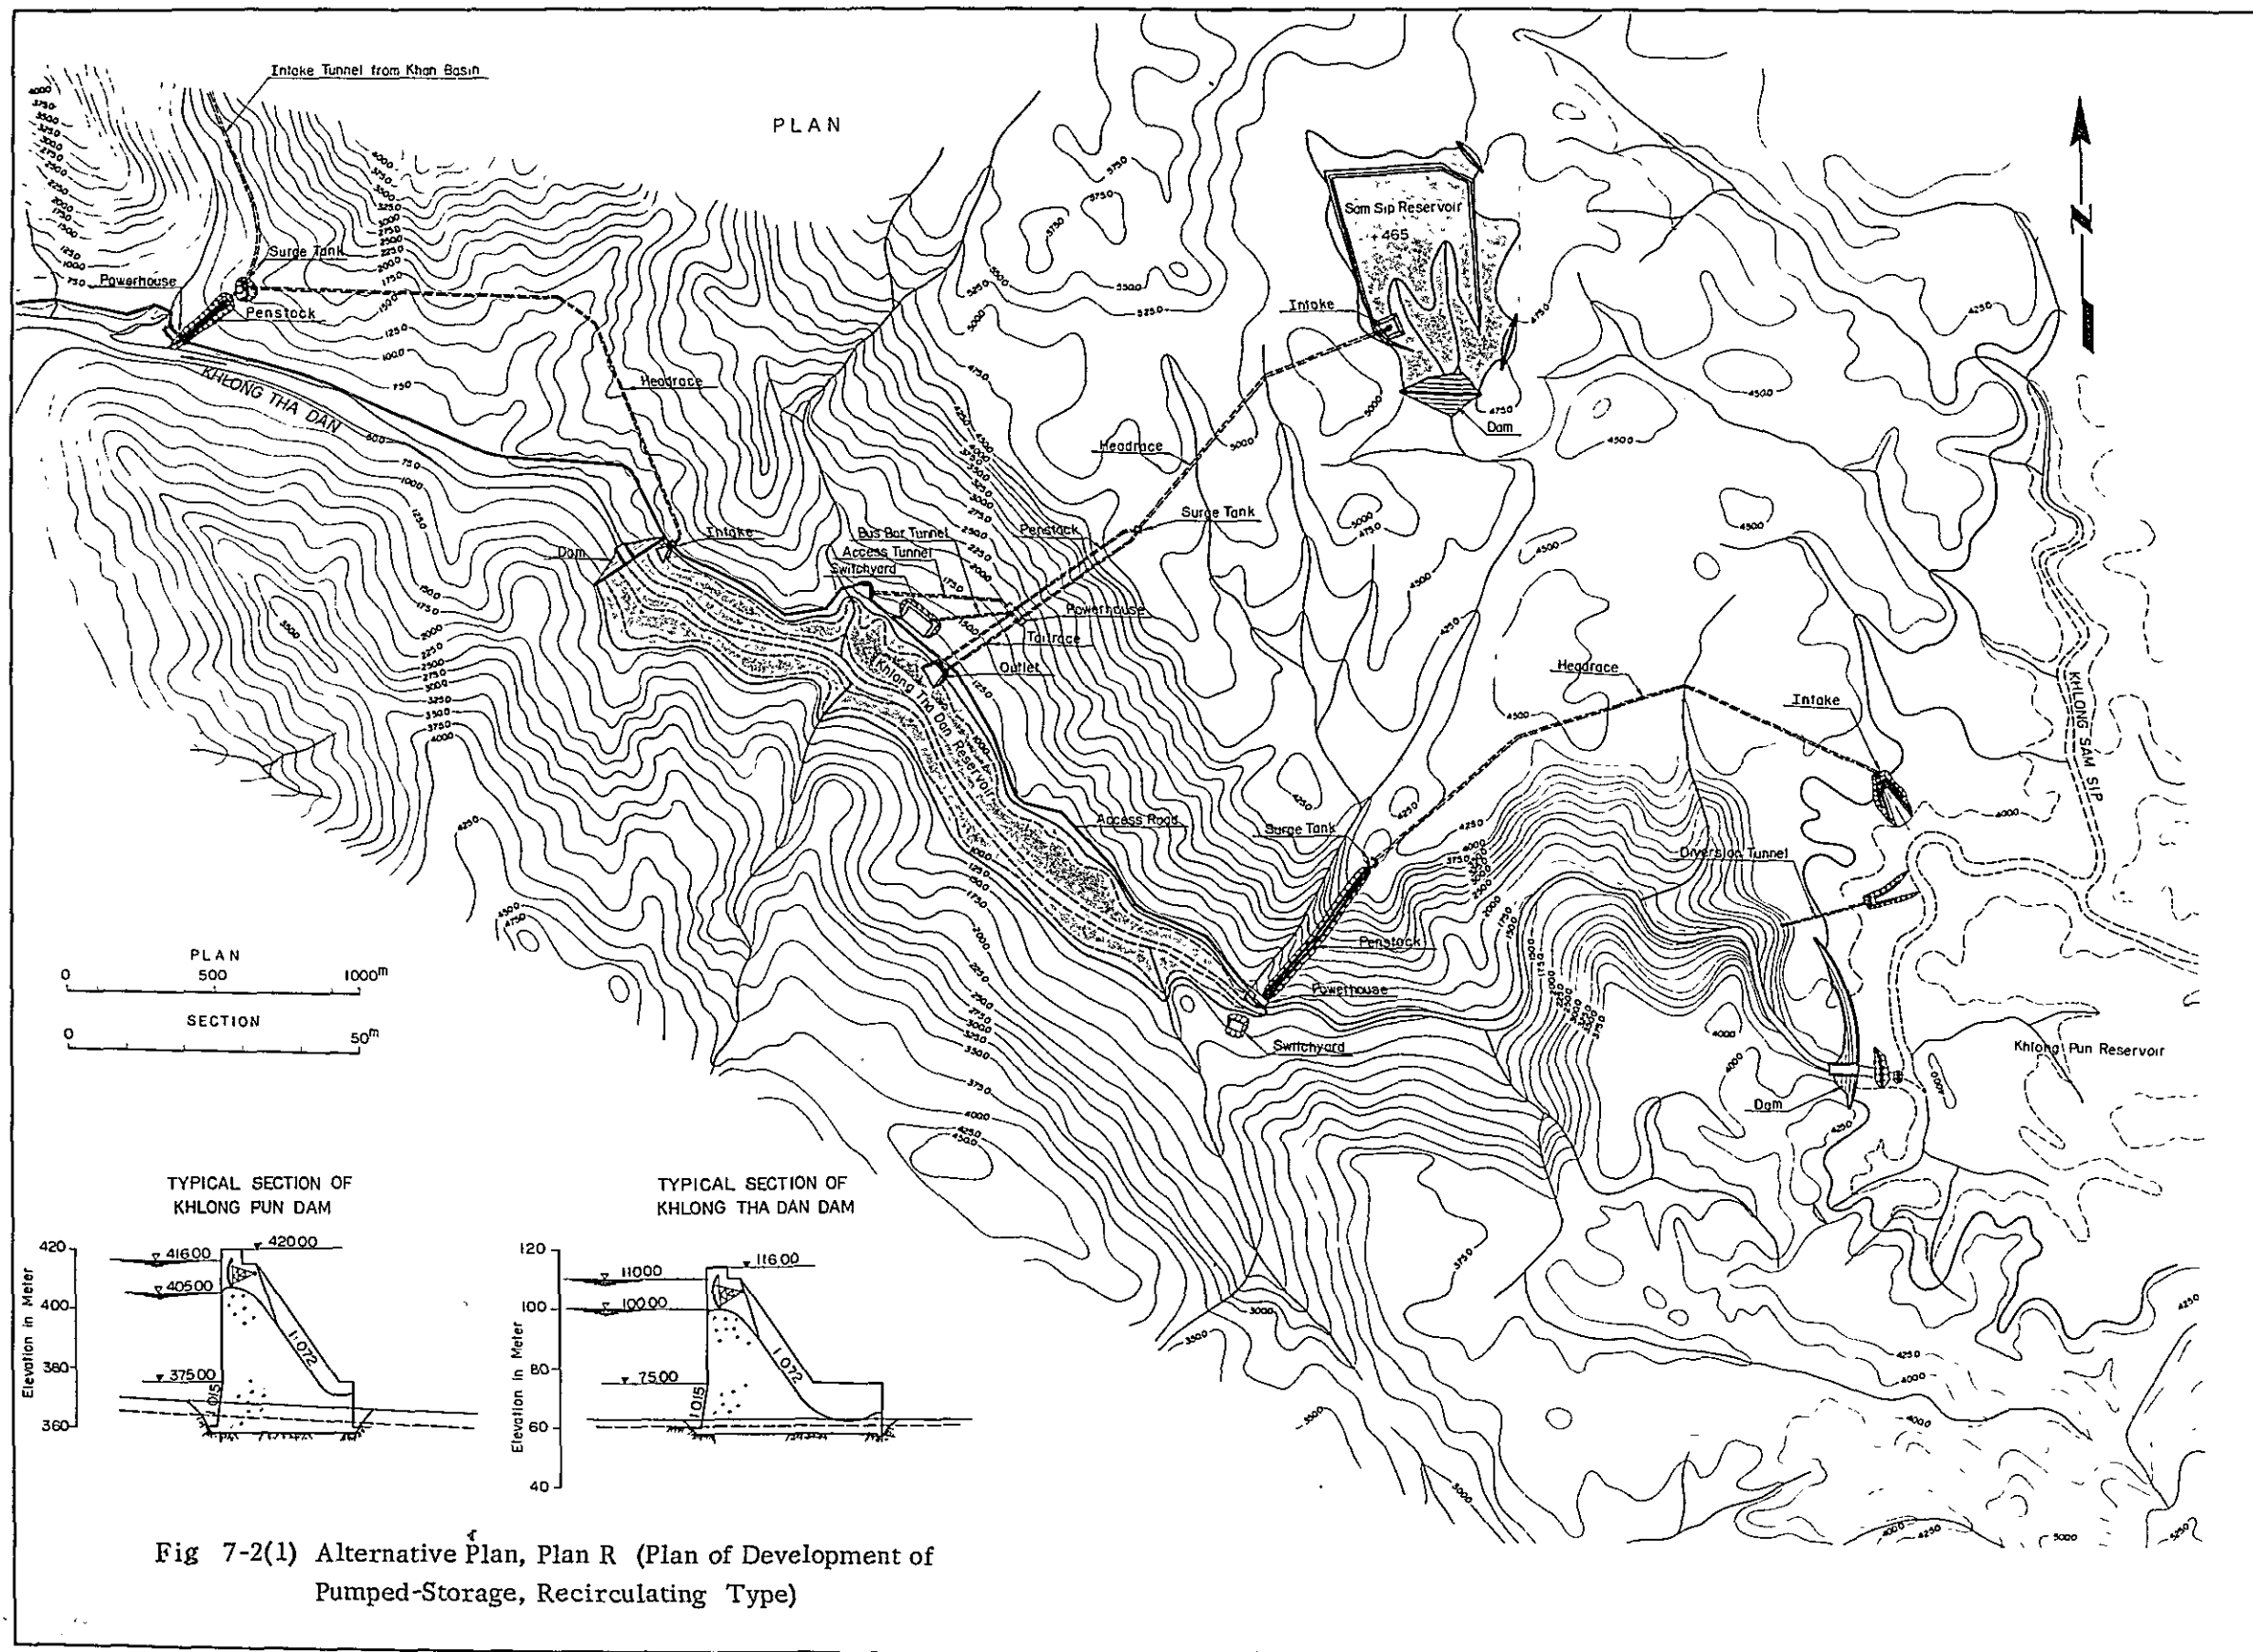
(1) Alternative Plan, Plan R (Plan of Development of Pumped-Storage, Recirculating Type)
